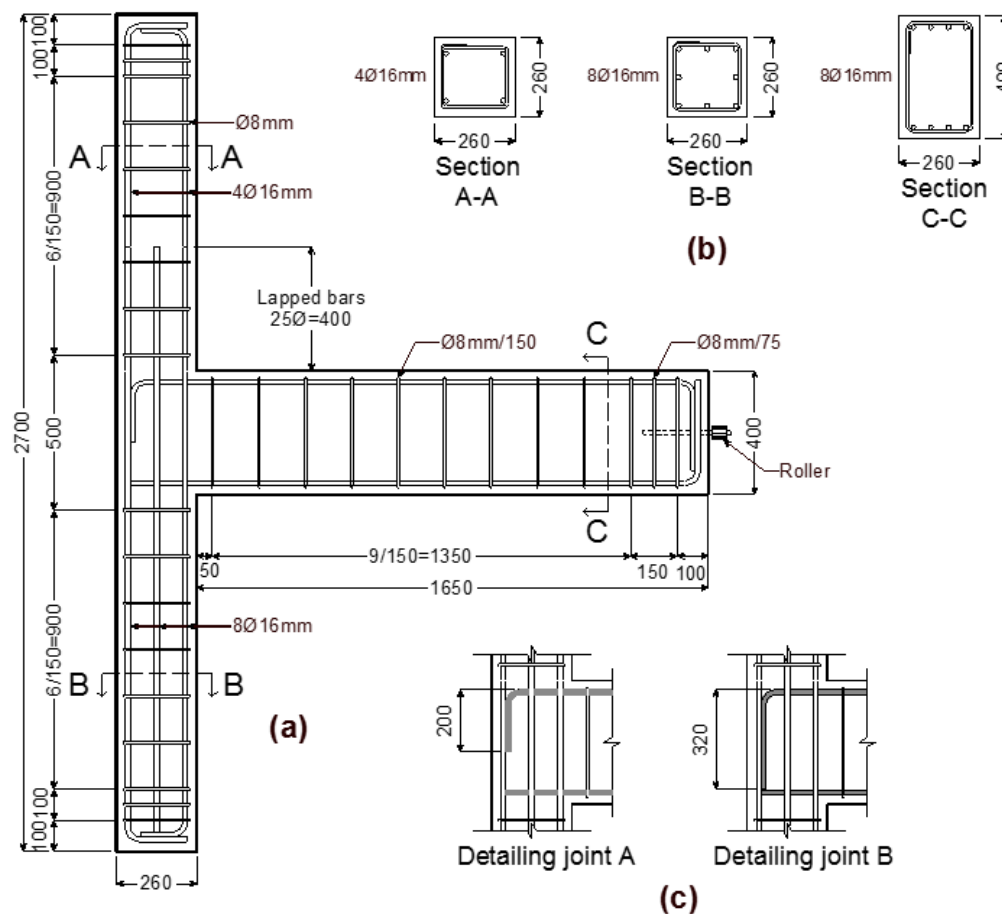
Reinforcement details and geometry of the RC joints (units: mm) [36].
